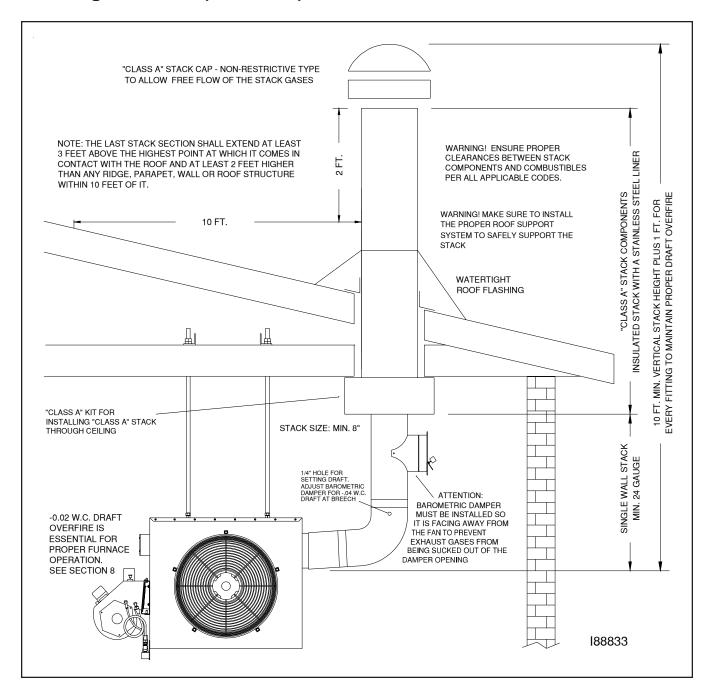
L - Installation of "Class A" Stack Through Roof/Ceiling
